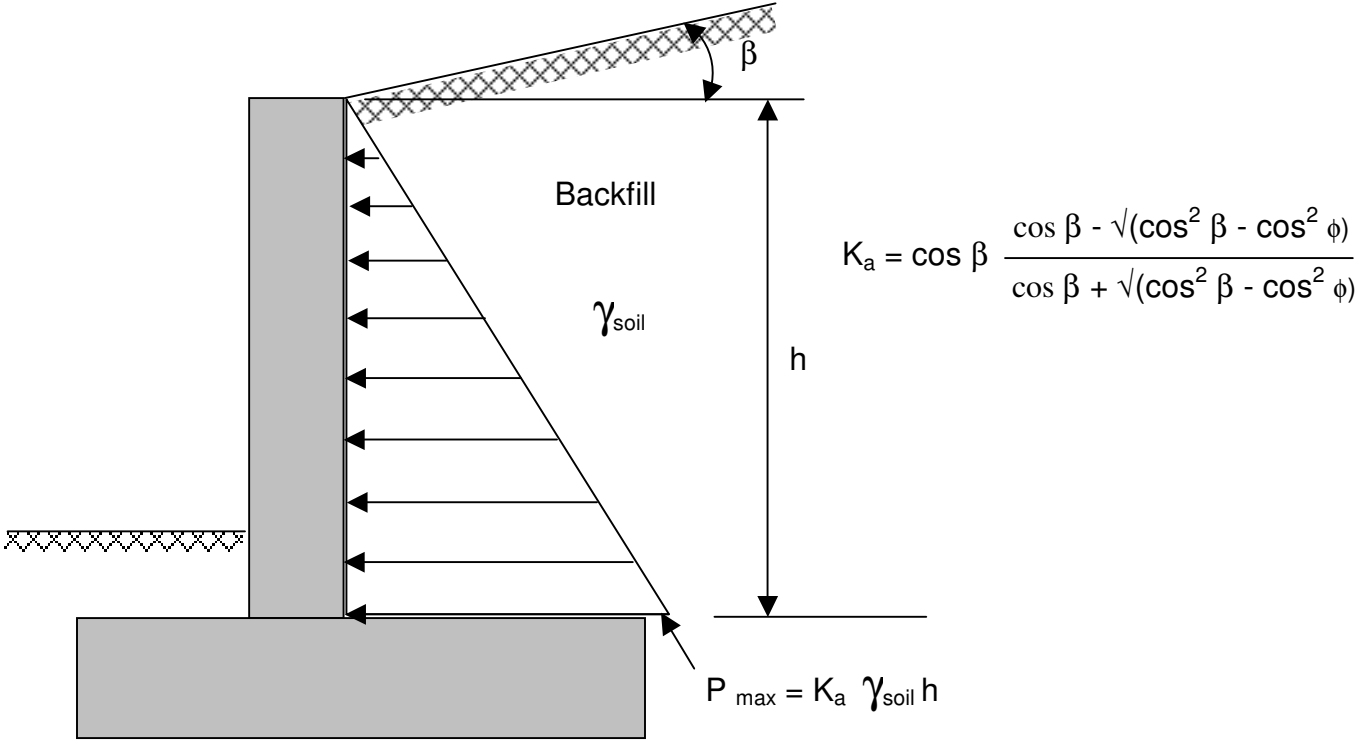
Soil Pressure on the back of wall (Sloping Backfill)
